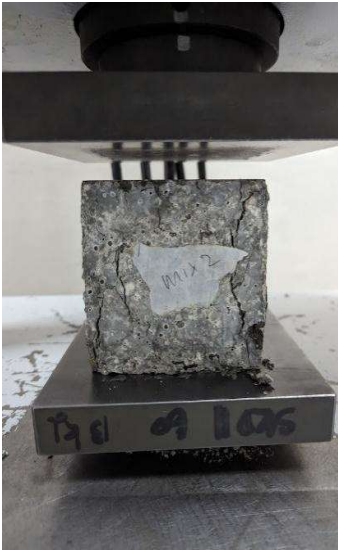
Precast Concrete Cube Sample with Eggshell Implementation
